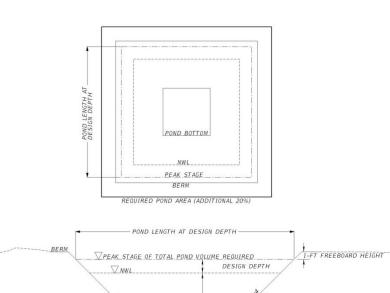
POND SIZING TYPICAL SECTION (NOT TO SCALE)
